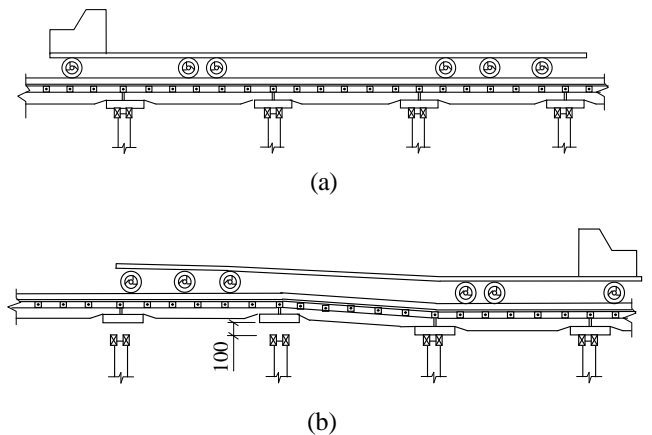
Orientation of the truck on the bridge deck (a) typical elevation of the bridge during testing, and (b) truck position for span loads causes hogging to middle span.
